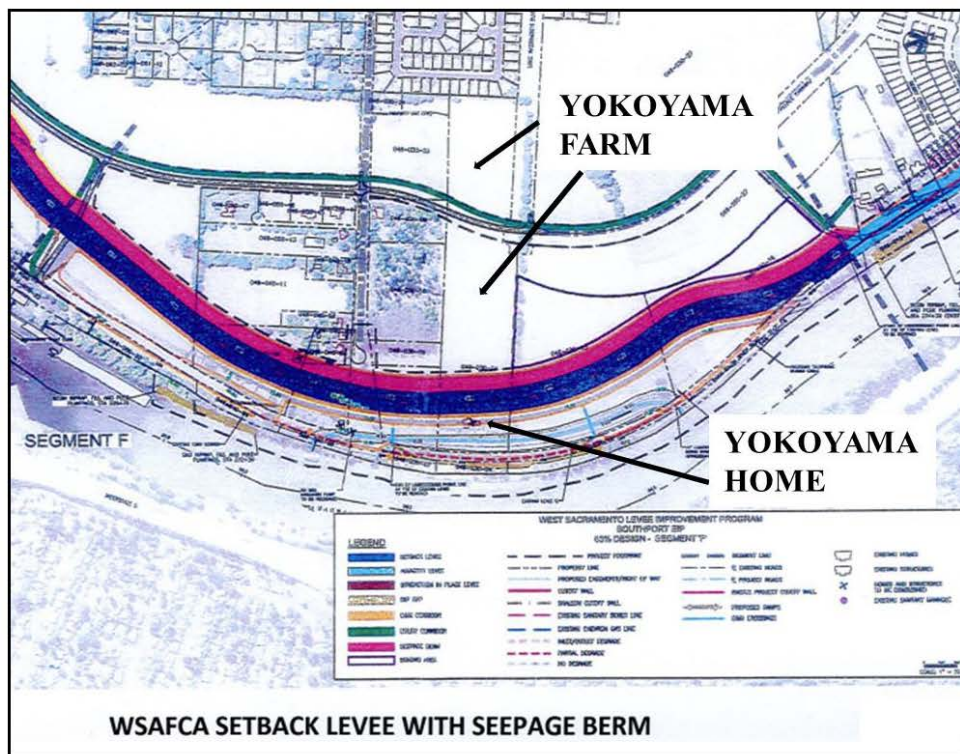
The Yokoyama house and farm in Segment F and the position of the setback levee and Village Parkway Road in the WSAFCA Alternative Plan 5 that will result in condemnation of the fourth generation Japanese American family home in the inter-levee floodplain, and division and loss of farmland established in 1966.
